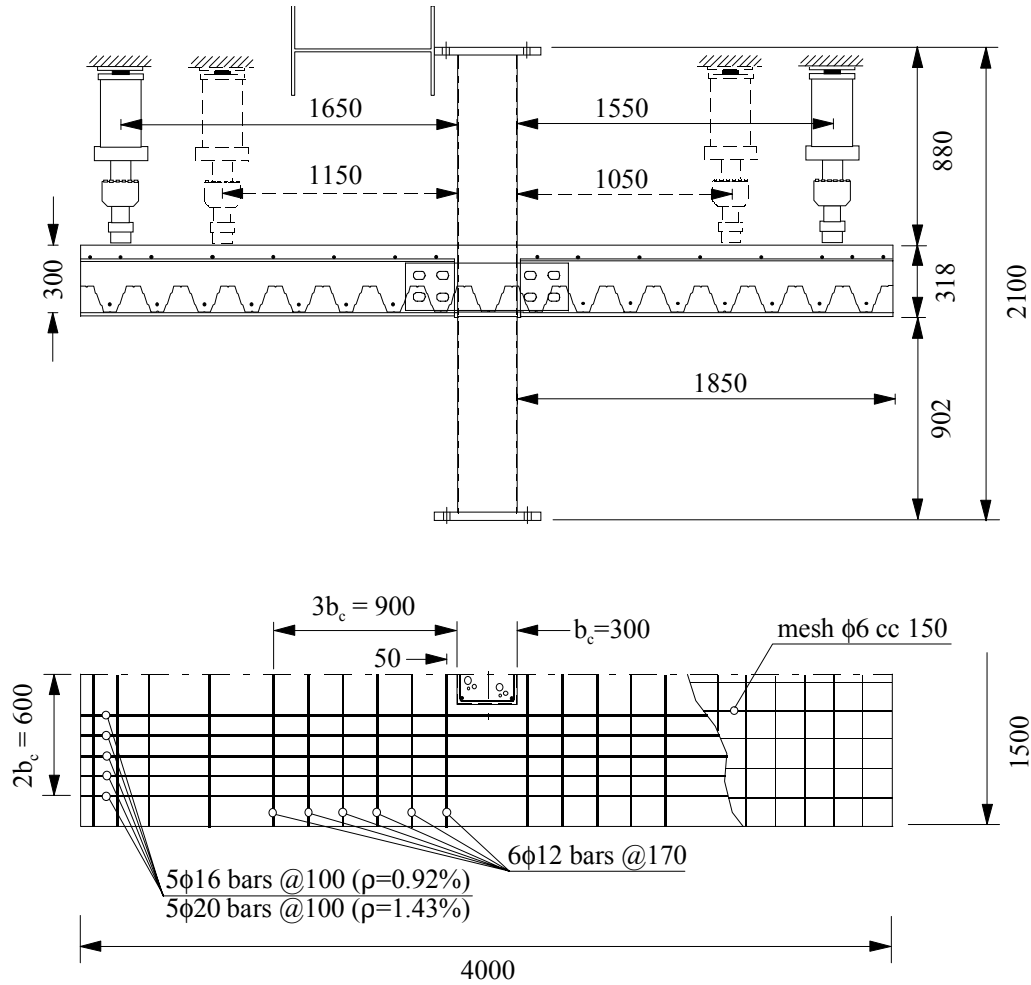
General arrangement of the test set-up and the reinforcements.
